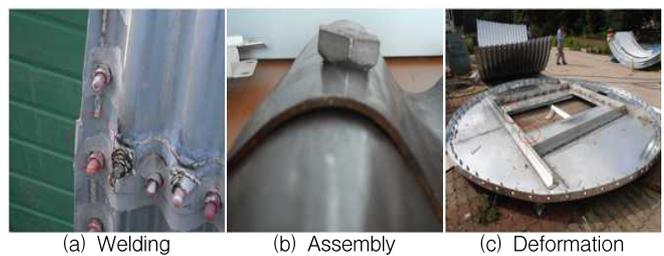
Apertures caused by welding, assembling, and material deformation
